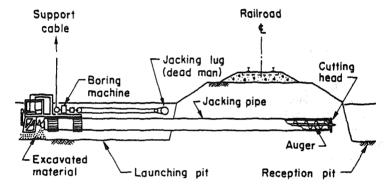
Direct Installation of Casing Pipe with Cradle-Type Auger HEB
